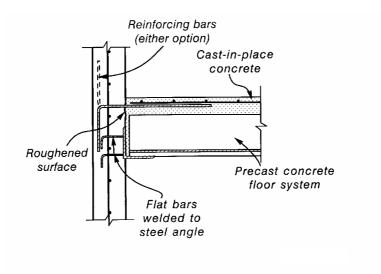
Exterior wall-floor slab connection detail: Continuous wall with steel ledge
